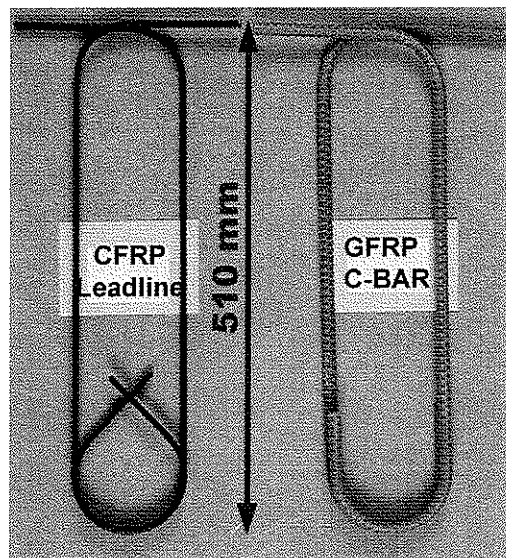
Configuration of FRP stirrups used in beam specimens
